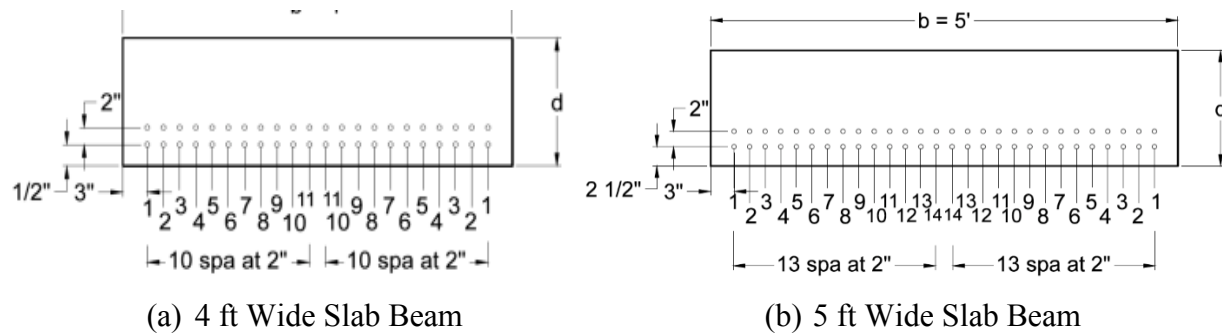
Section Geometry and Strand Details of Slab Beam Girders.
